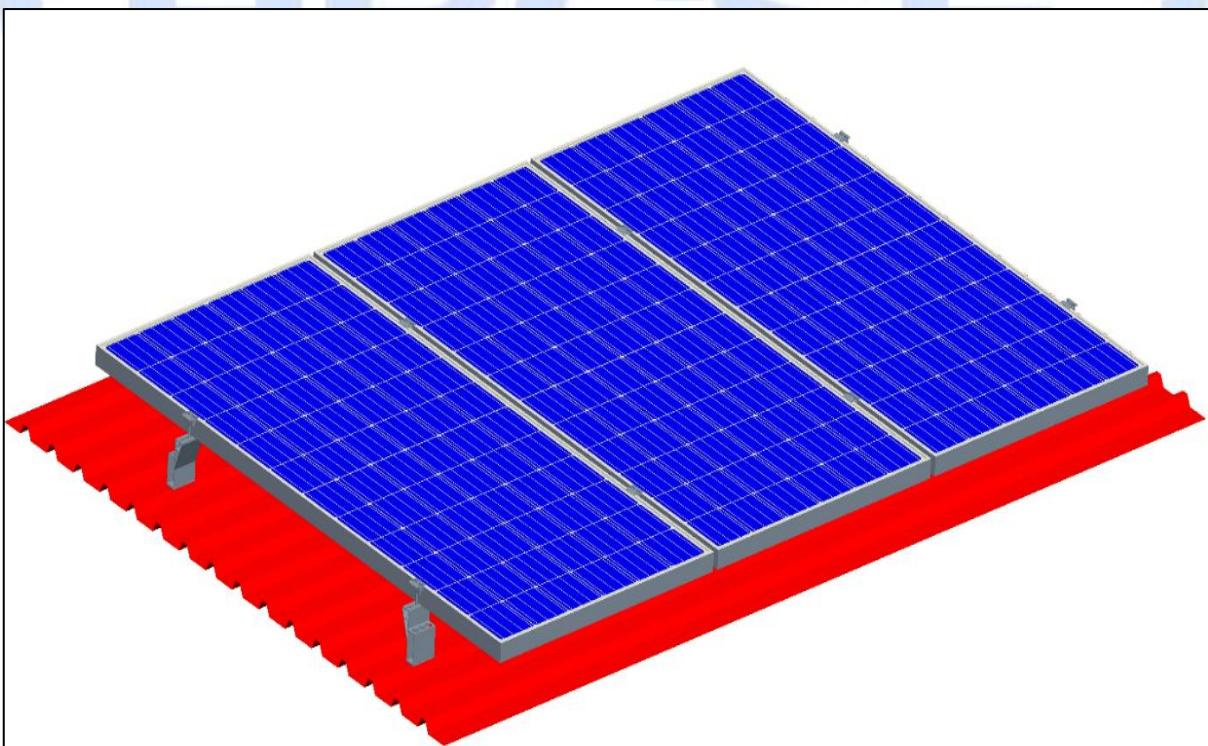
Typical Solar Panel Affixed to the Metal Sheet roof.
